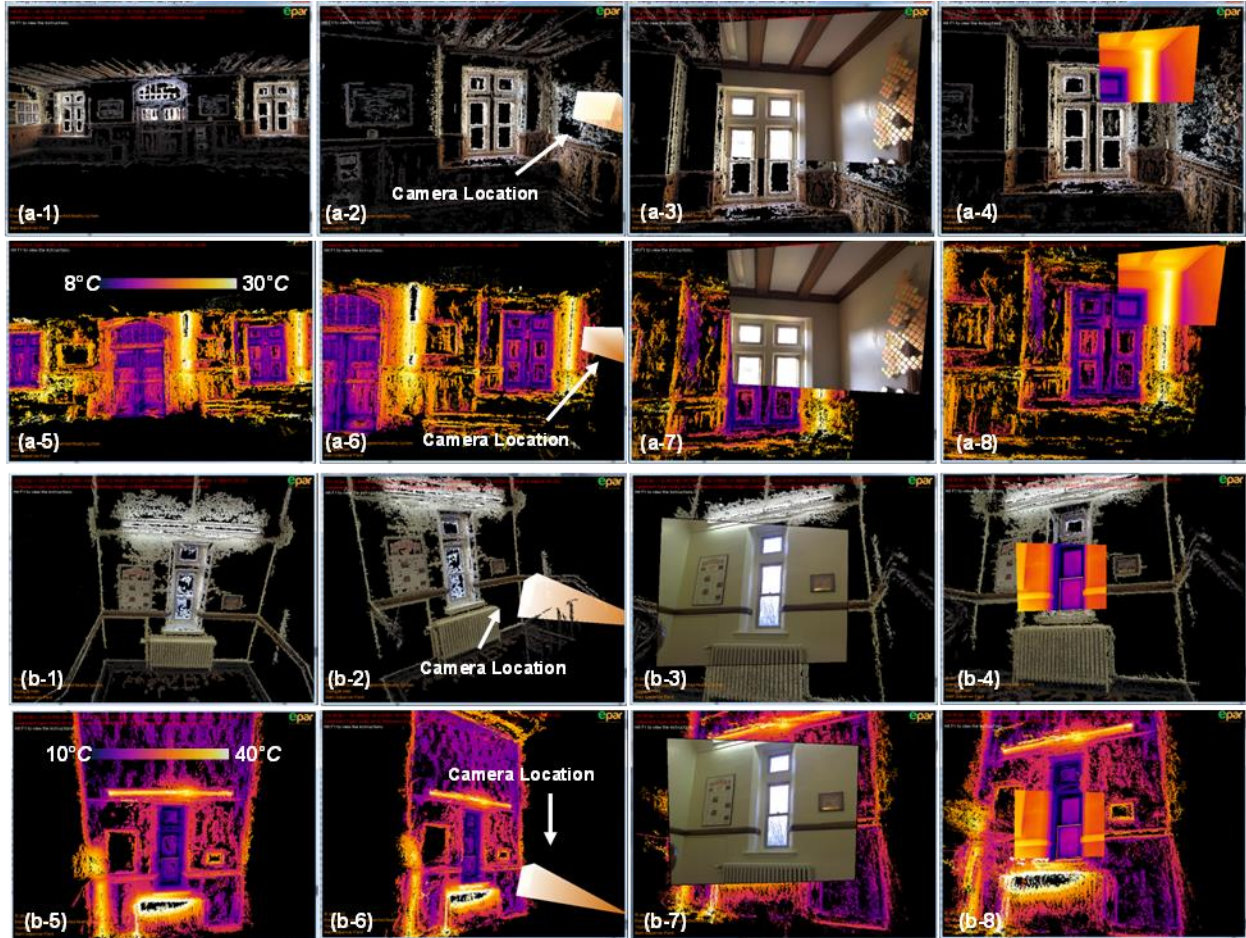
3D Building Geometrical and Thermal Point Cloud Models: (a) a Main Hall of the Instructional Facility (IF#3); (b) a Corridor of the Instructional Facility (IF#4)
